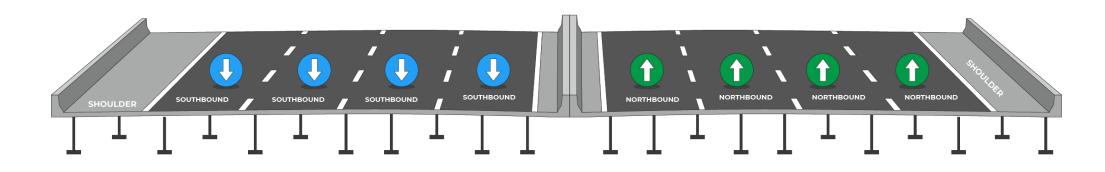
Potential Bridge Rendering, Looking Northeast
